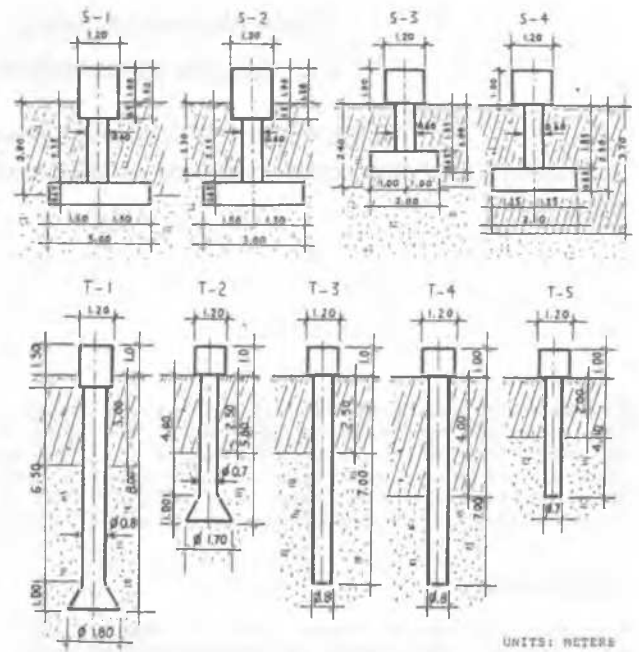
Footings and Pier Foundations Geometry and Soil Layers
